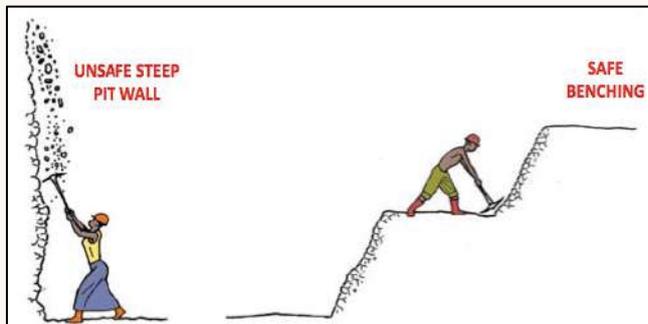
Benches will help prevent pit wall collapses so you can continue working.
